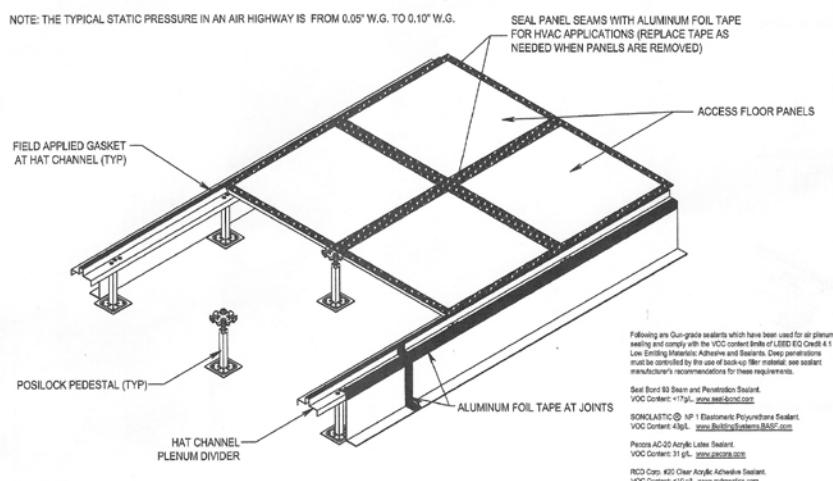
Typical construction of a sealed posi-lock plenum floor that provides a static air highway between the theatre school light shaft and exterior interface.
